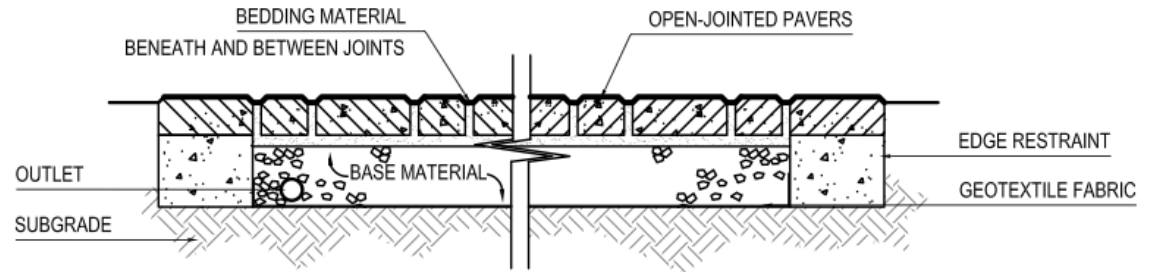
Section of Type F Open-Jointed Concrete Unit Paving.
